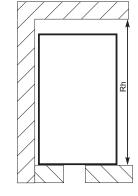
PRO-AIR installation side view left side on access floor, right side on concrete floor
